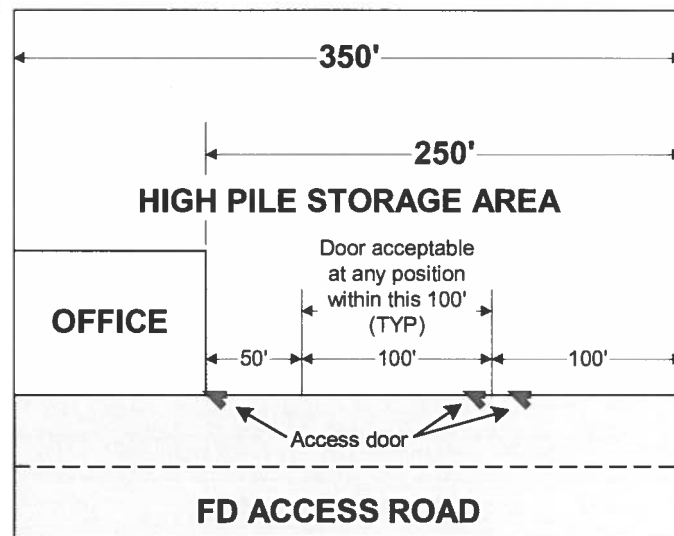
ACCESS DOOR REQUIREMENT AND LOCATION EXAMPLE
